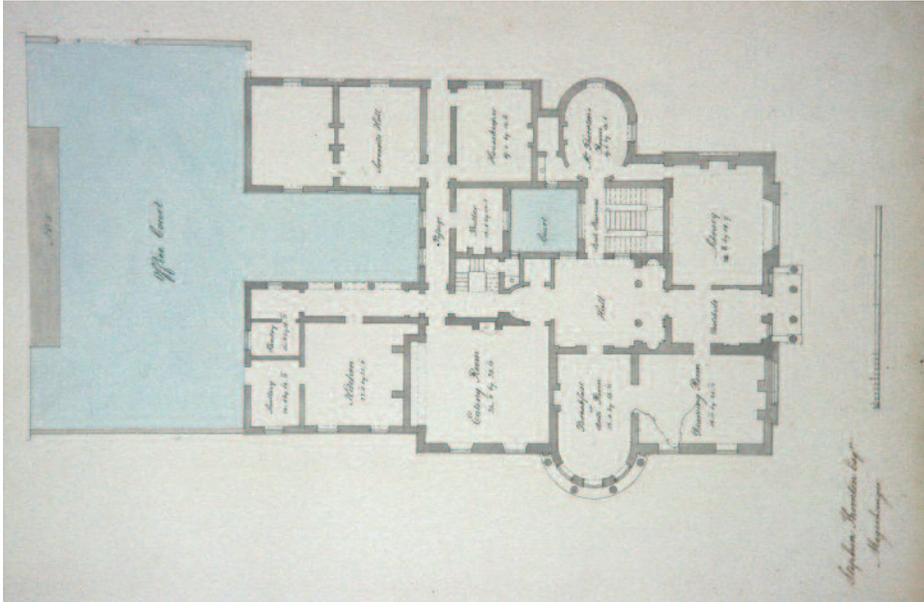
John Soane, Moggerhanger House, ground floor plan, proposal, 1807. North is at the top.
